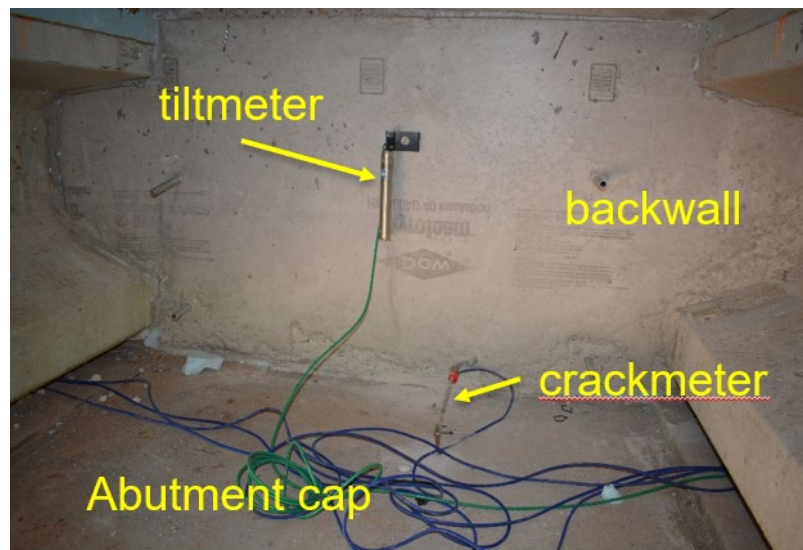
Crackmeter installed for measuring relative displacement between abutment cap and abutment backwall + tiltmeter installed on abutment backwall
